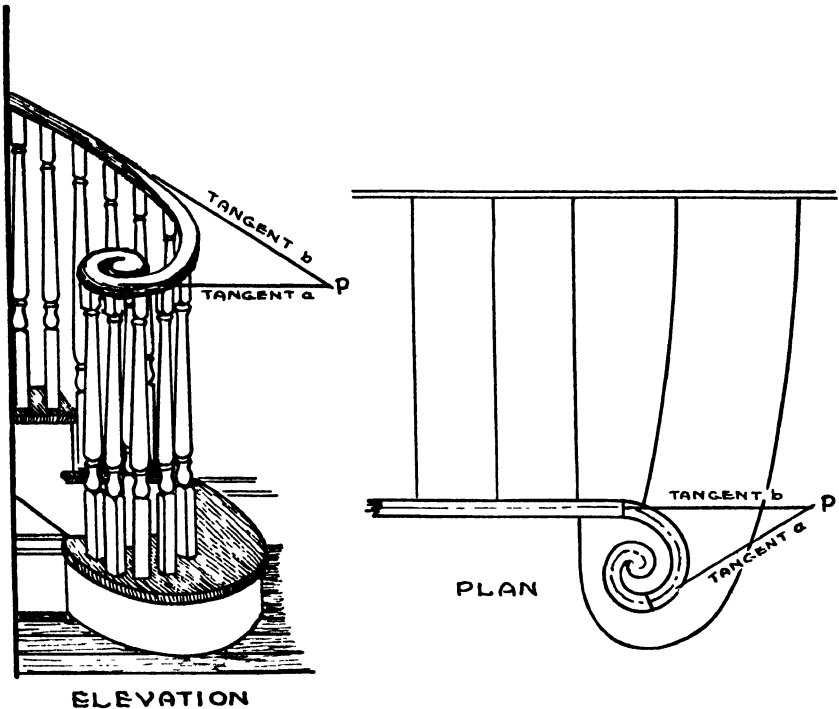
Elevation and Plan of a Portion of Staircase Showing Curved Bottom Step
